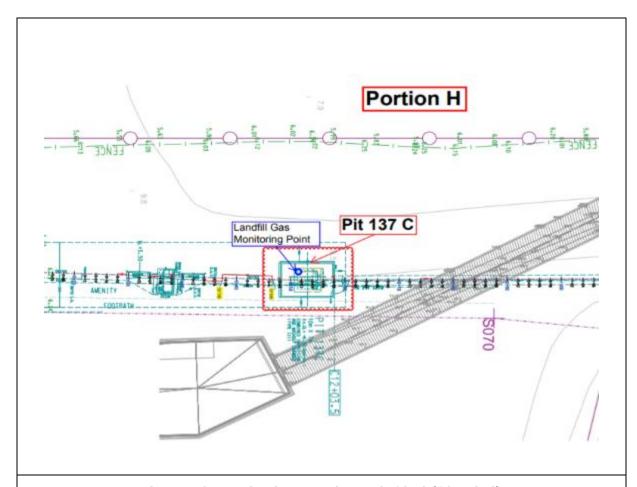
Monitoring Location - Pit 137C (137 Pit C)
